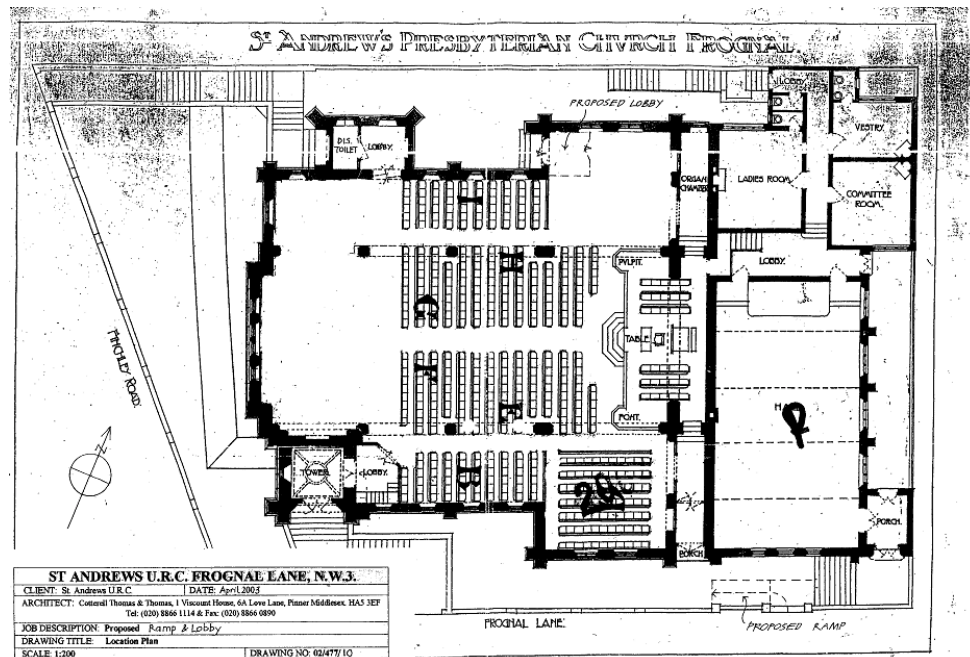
Plan of St Andrew’s Church, the Hall and Parish Rooms including Ladies Room, Vestry and Committee Room drawn in 2003 but based on earlier plans
